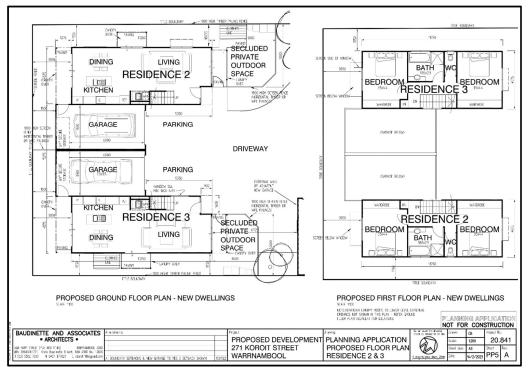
Proposed Floor Plans – Proposed Dwellings. Source: Application Documents.
